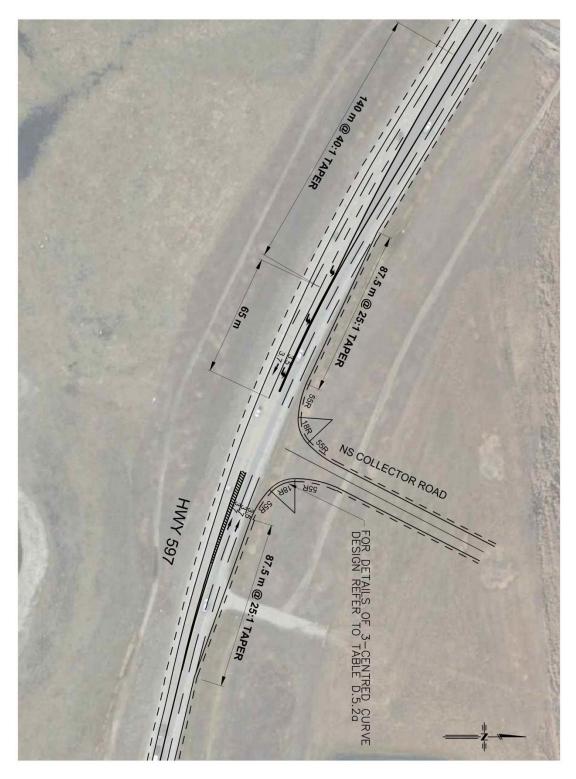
Proposed Intersection Improvement Concept Plan (South Access)
